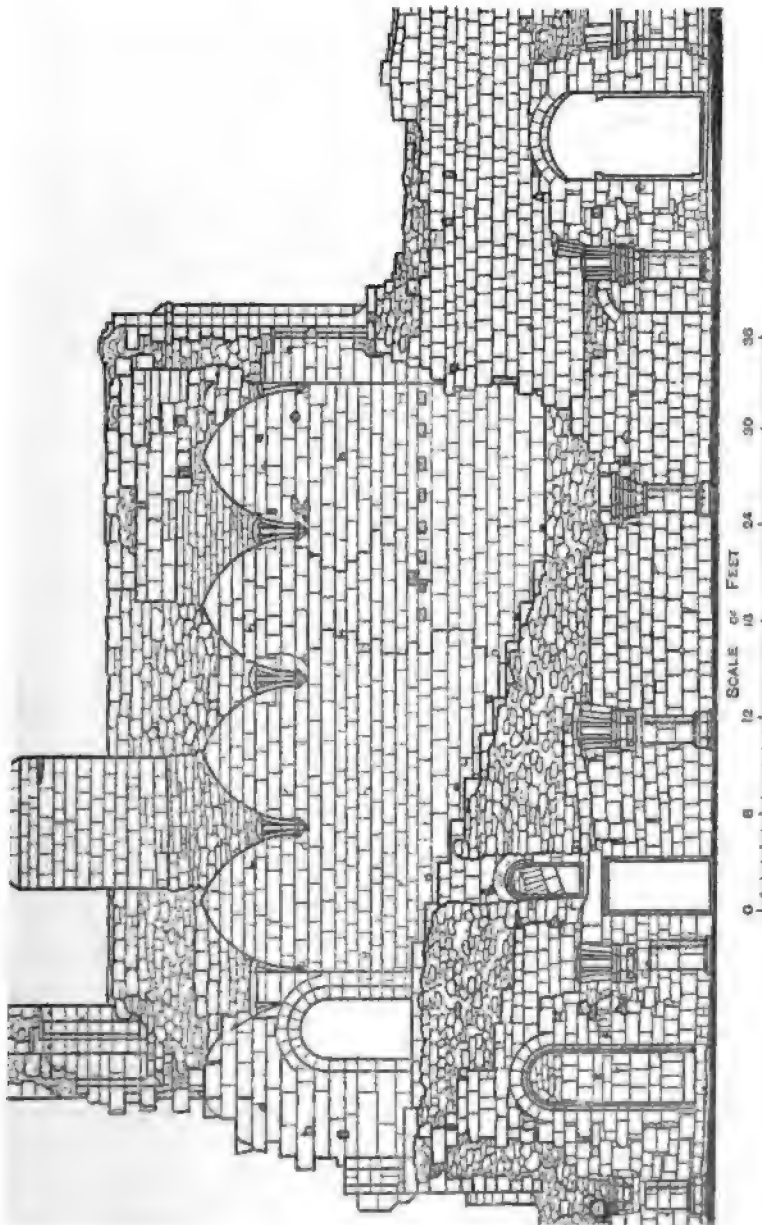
Elevation of the west side of the dorter subvault and of the staircase wall beyond it.
